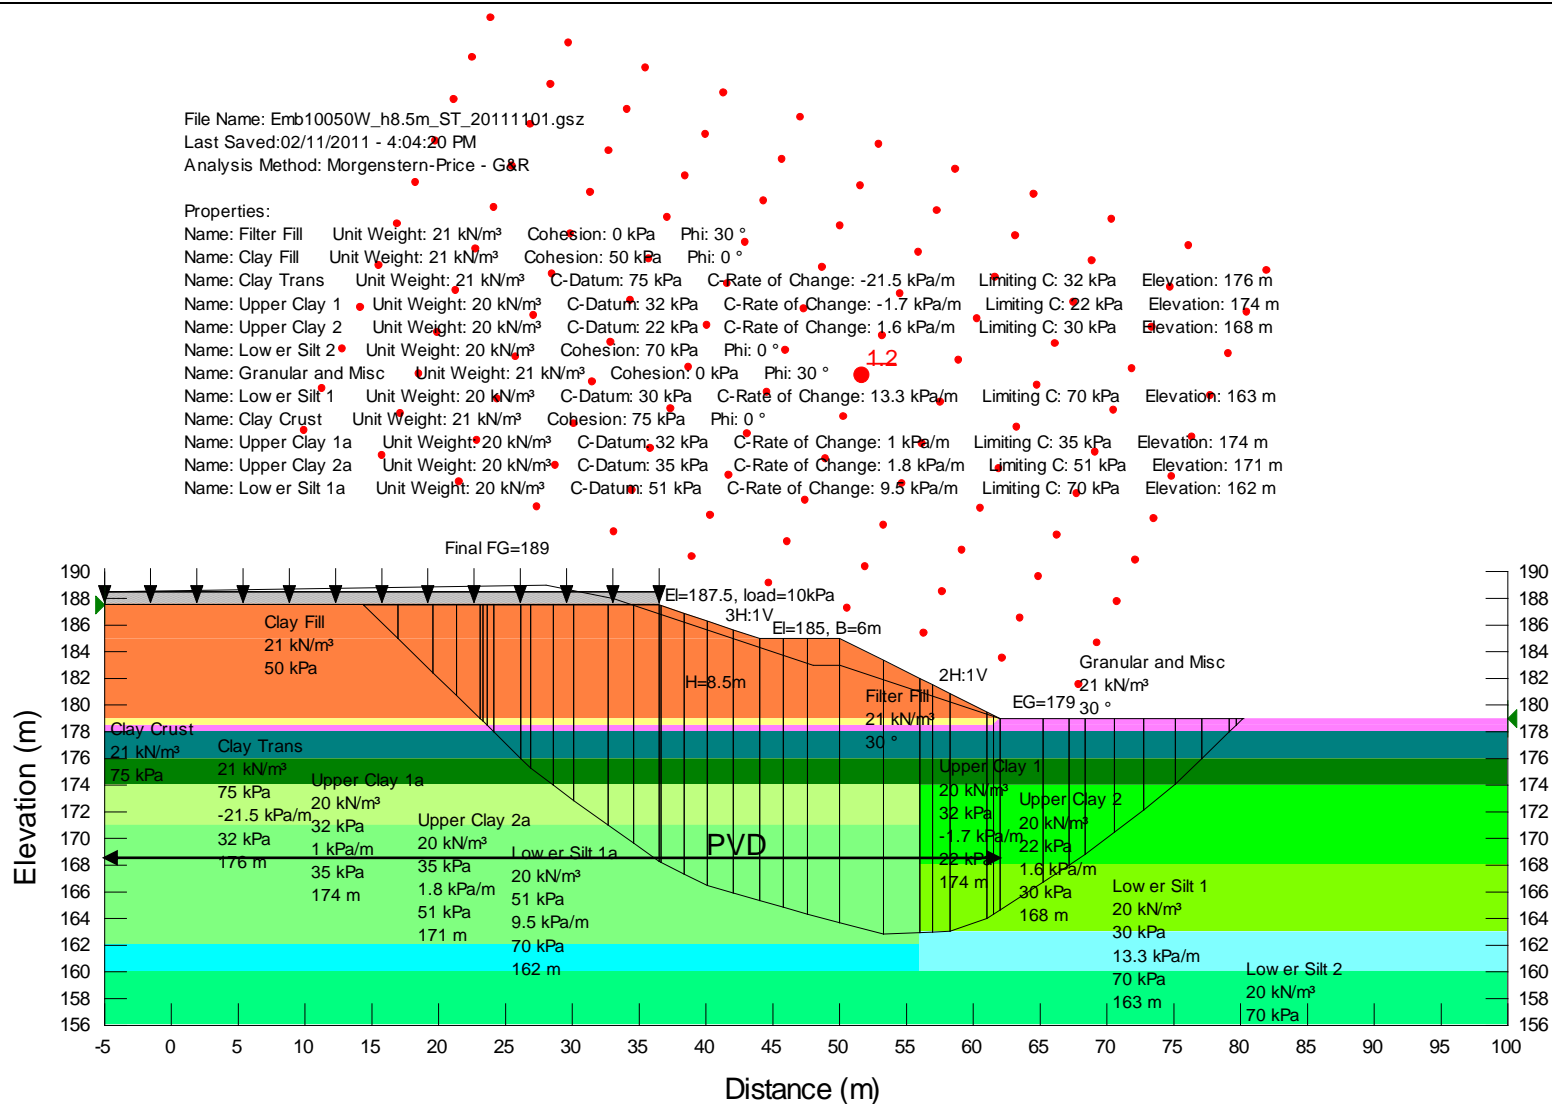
Slope Stability Result – Section 1 (Sta. 10+050W) – Stage 3 (El=188.2) – Short-term Loading
